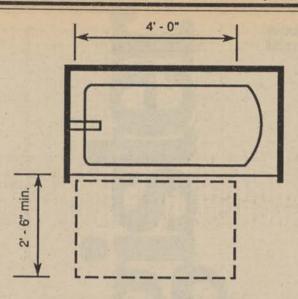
Alternative Specification - Clear Floor Space at Bathtub
